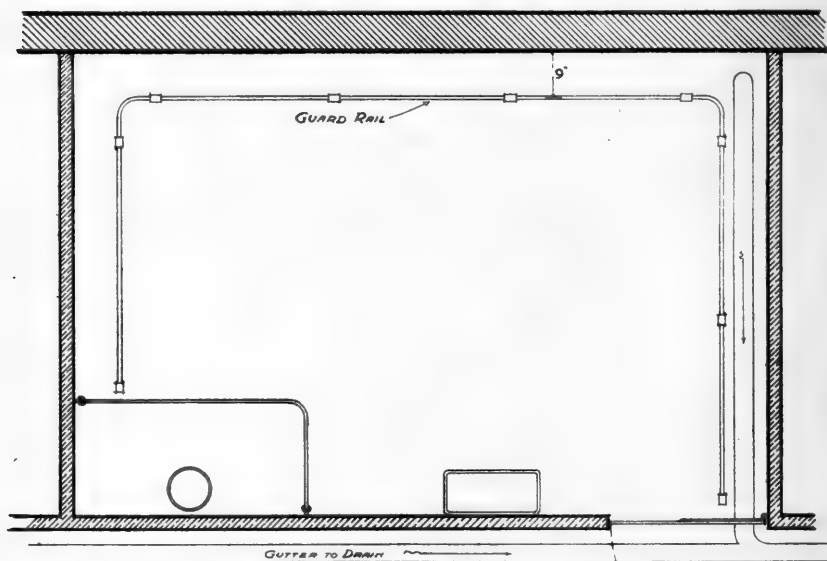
Plan of a farrowing pen showing the position of the guard rail, the food-trough and the weaning pen with food-trough for young pigs enclosed. The guard rail should have supporting ties to the walls.
